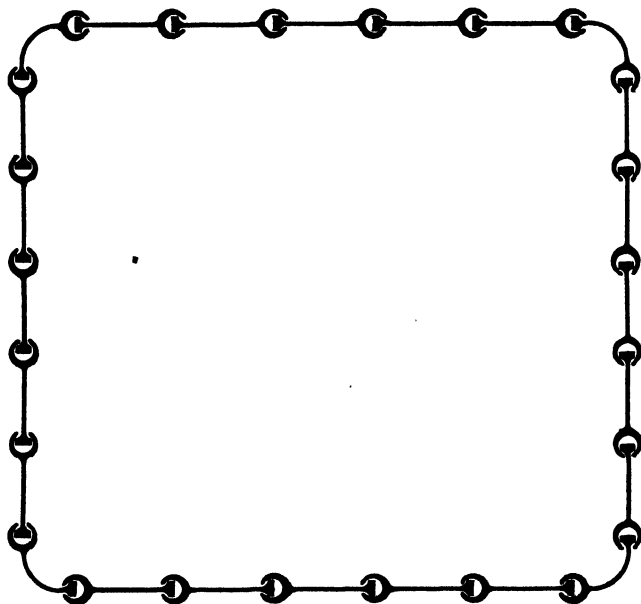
Plan of a Test Pit with Steel Sheet Piles.
